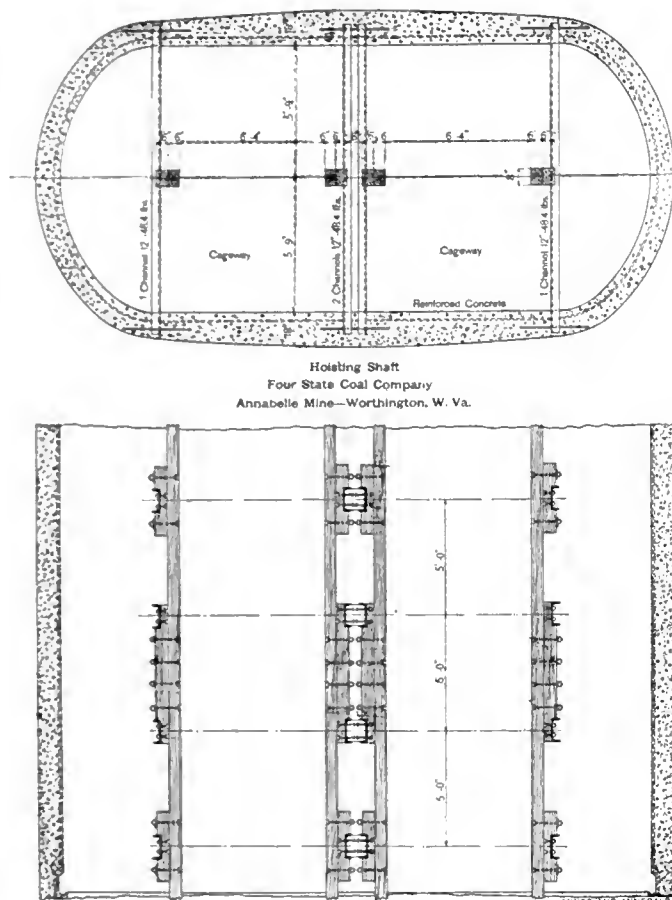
ELLIPTICAL CONCRETE HOISTING SHAFT, WITH STEEL SHIP-BUILDING CHANNEL BUNTONS
